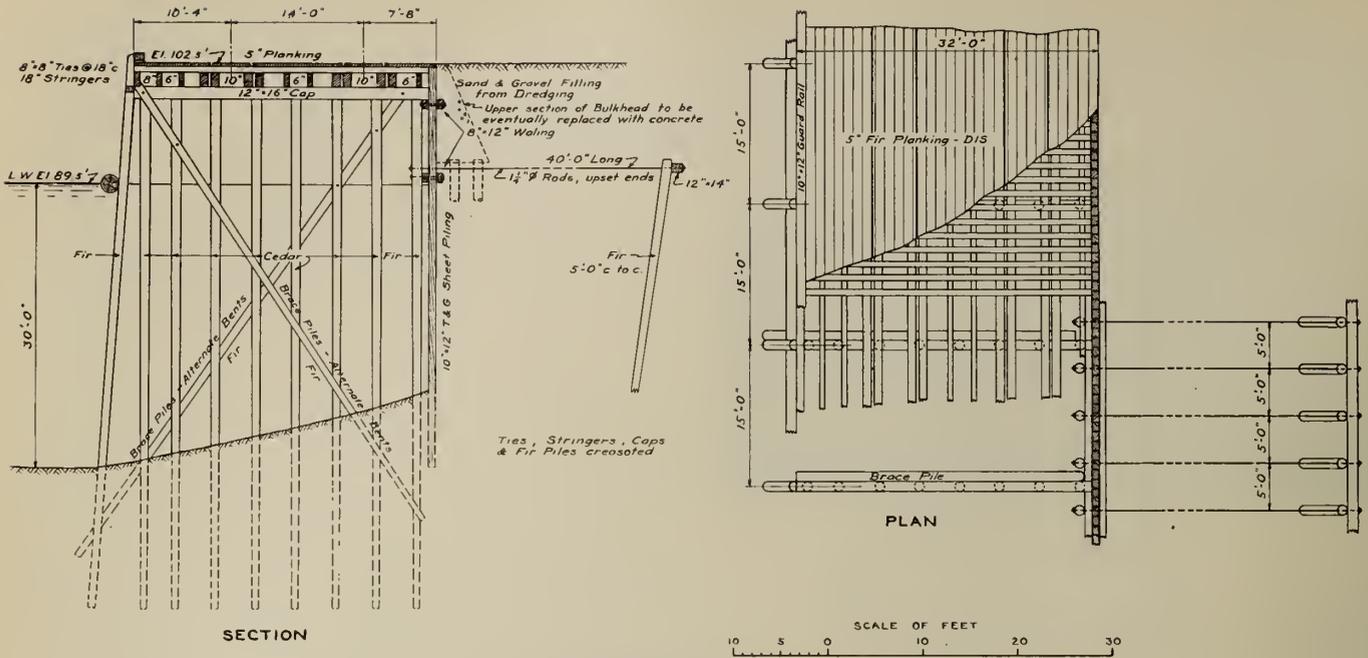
Typical Wharf and Bulkhead Construction, New Westminster, B.C.
